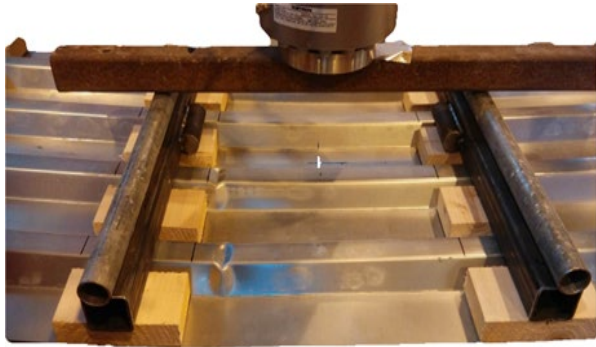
Deformed shape of composite panel (specimen F-BSB)
